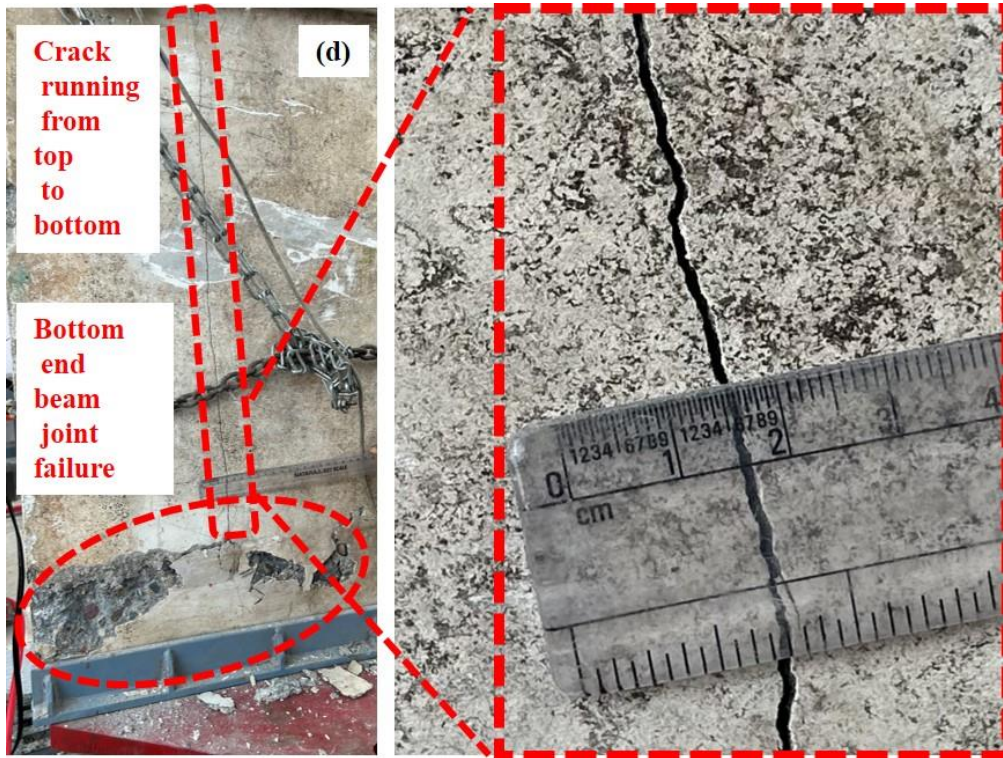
35: WP I specimen showing the spalling of concrete at the bottom end beam and panel joint, and the magnified view of the longitudinal crack propagating in the middle of wythe.
